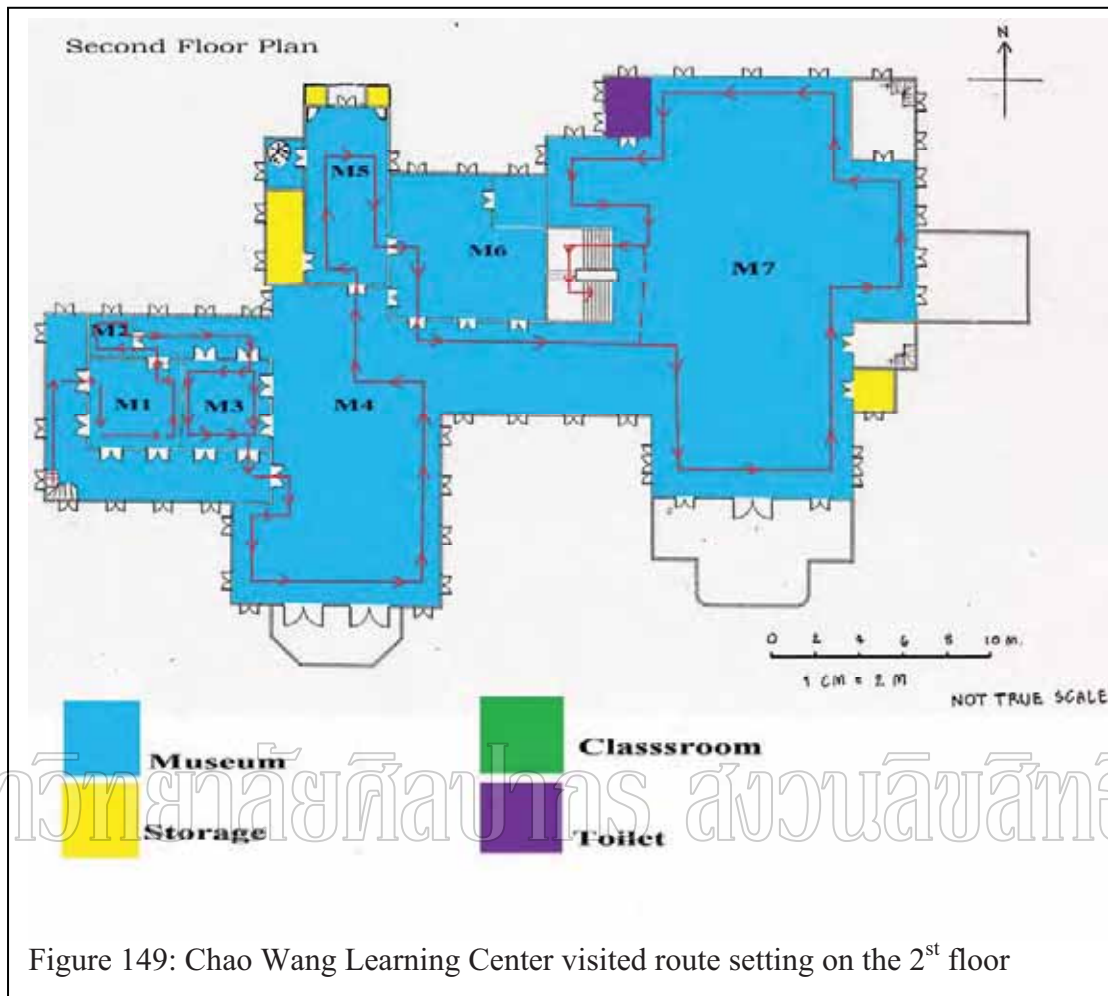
Chao Wang Learning Center visited route setting on the 2<sup>st</sup> floor
